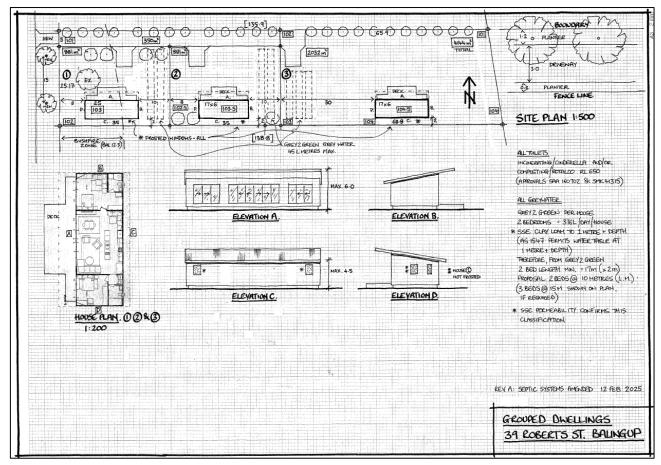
39 Roberts Street Plans dated 12 February 2025
